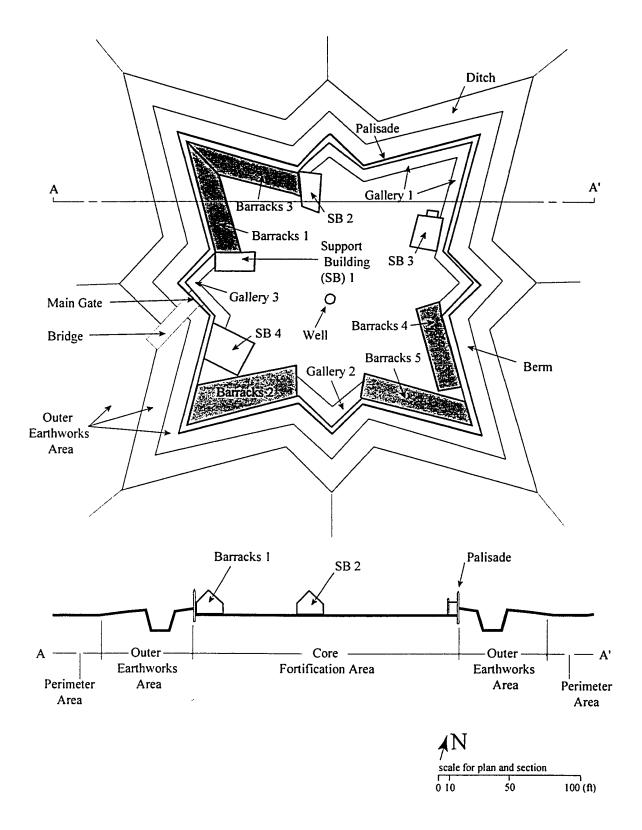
Plan and section of Core Fortification and Outer Earthworks area showing various buildings, structures and small-scale features. Based on plan "Plan of Oswego with its Forts as Beseiged by the Marquis of Montcalm August 1756," and plan "Plan of Oswego showing the State of that Garrison as it was on the 24th of May, 1756," Charles Demter, 1756. Graphic produced by R. Hetzler, SUNY ESF, 2003.
